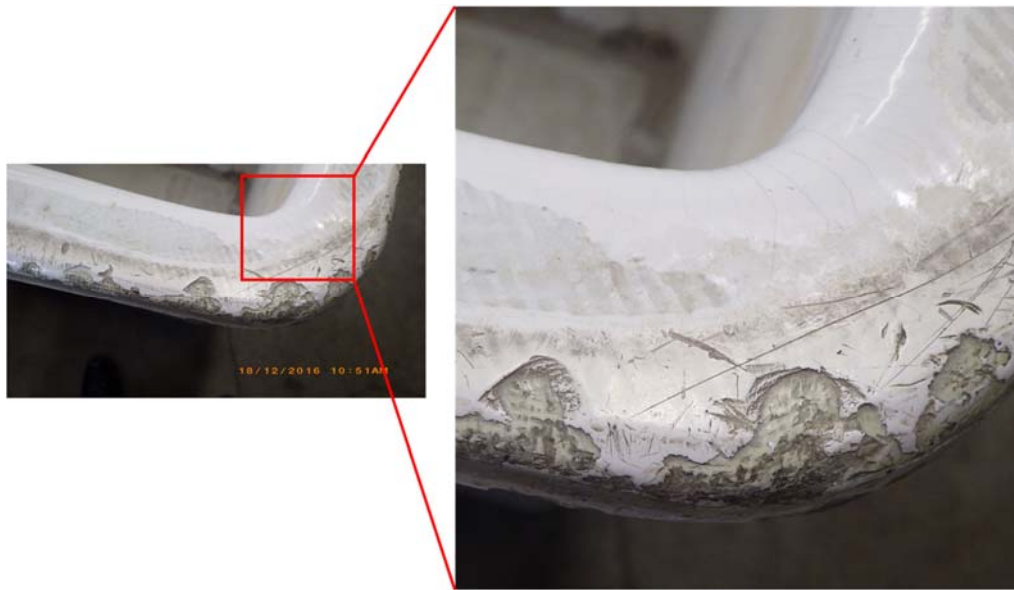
Corner cracking of subject platform consistent with non-vertical loading. Similar cracking was observed at other corners.
